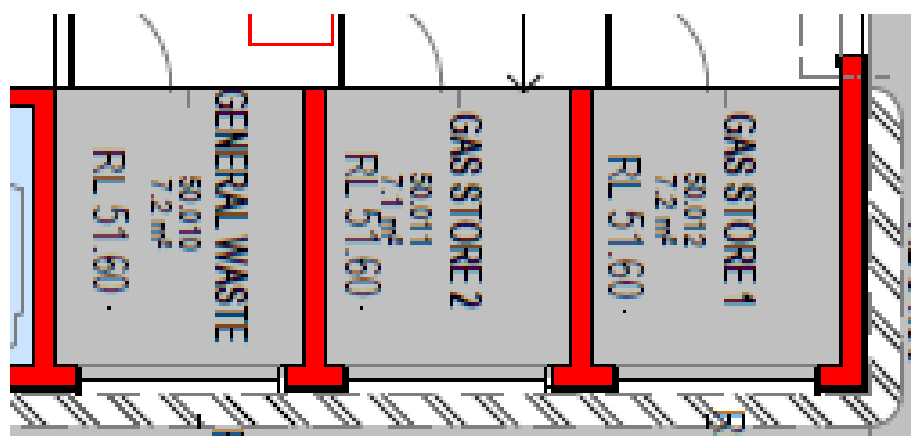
LPG Gas Cage (from drawing NHR-STH-DRW-ARC-TAM-20-101 Rev A)
